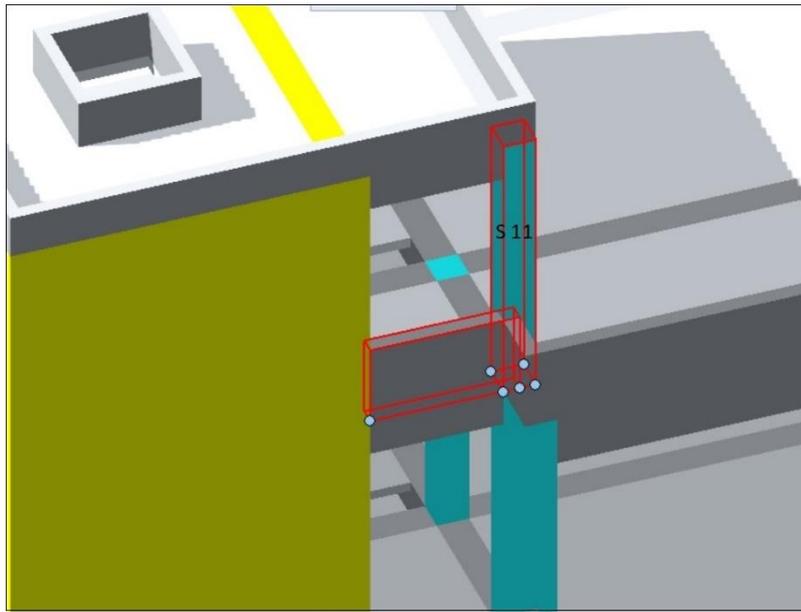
Modeling Mistake in Joint of Column and Parapet Wall in Allplan Model
